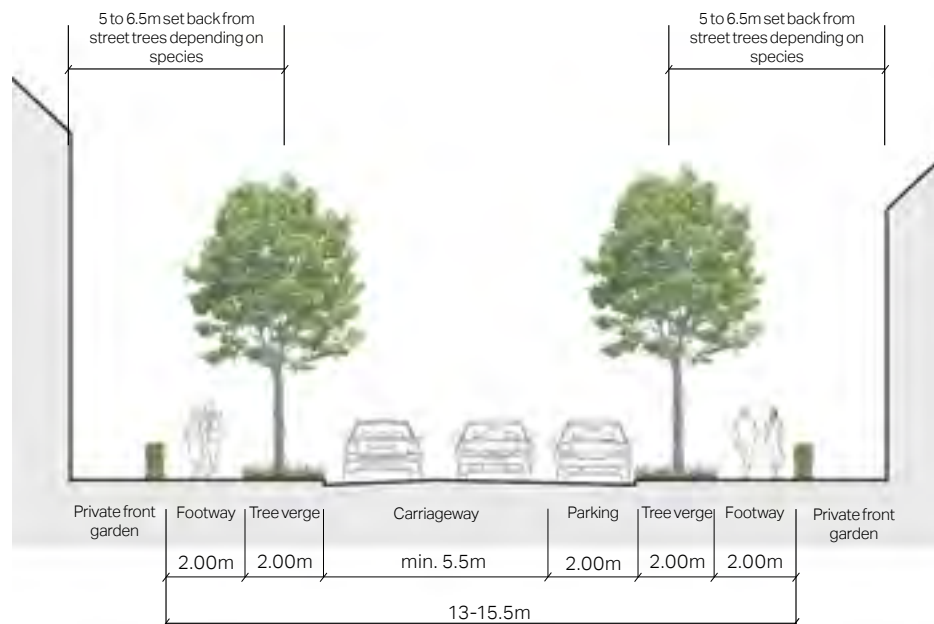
Cross-section to illustrate some dimensions for secondary streets.
